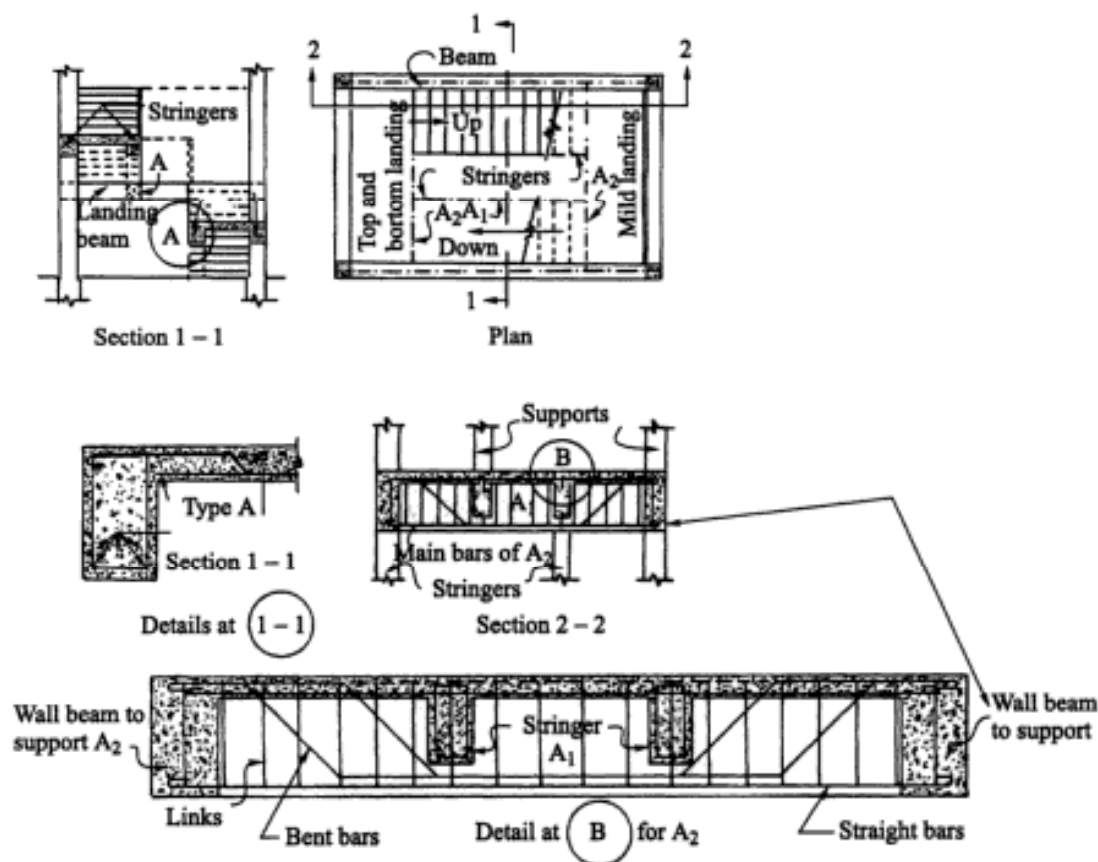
Layout and reinforcement details of stringer beams in relation to the main reinforcement of stairs.
